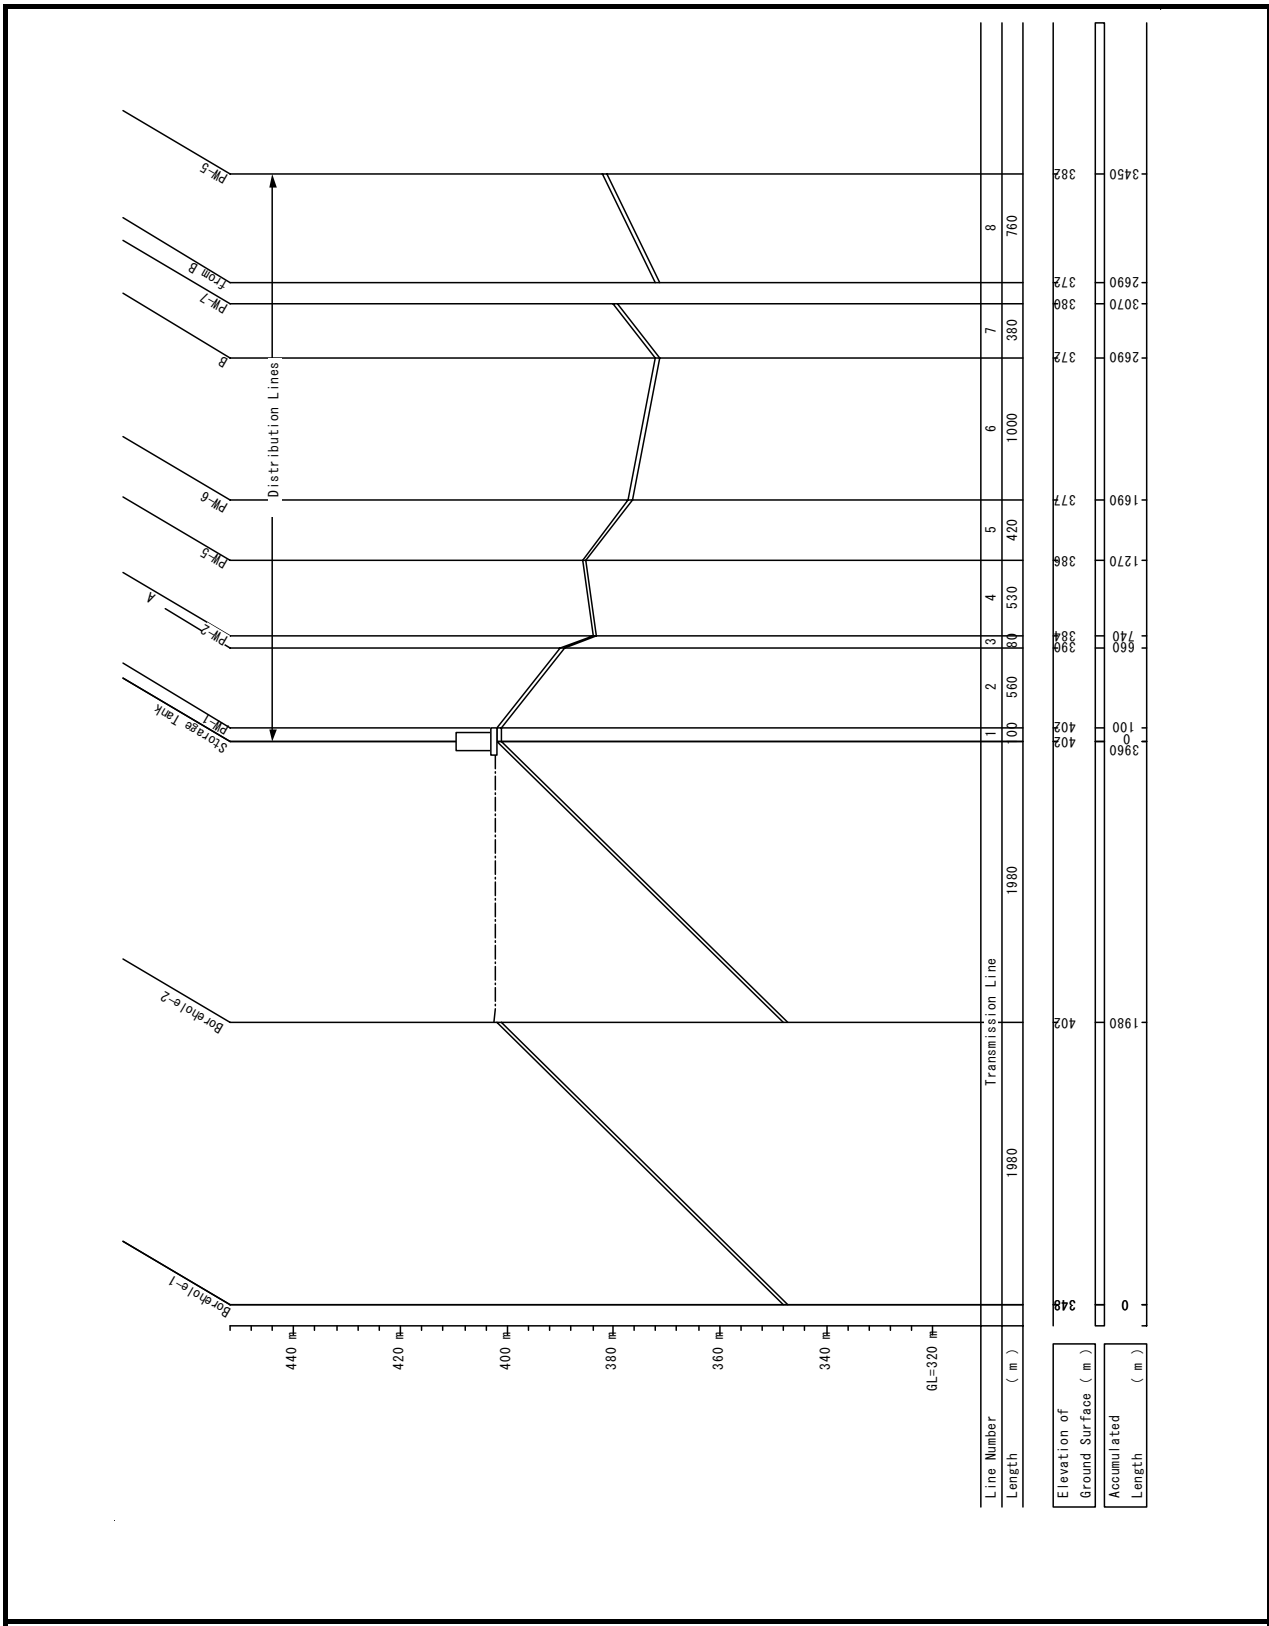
LONGITUDINAL SECTION (MSINBU: 6/22 (2))
